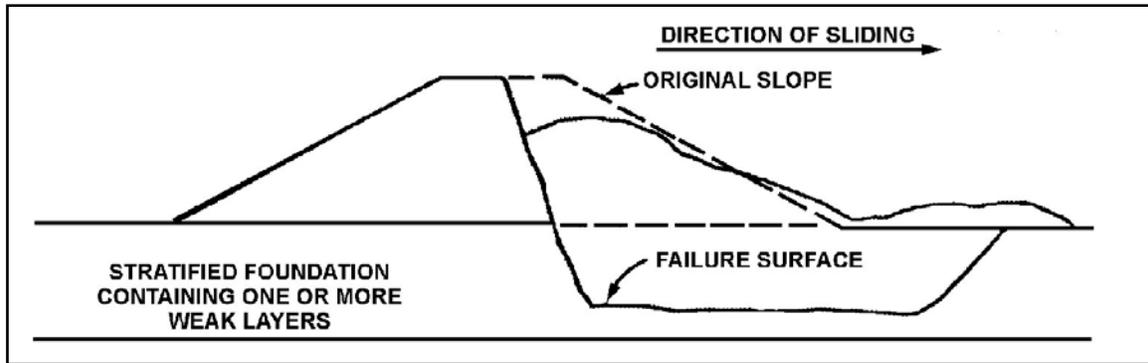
Translatory Failure in both a Dike and its Foundation
